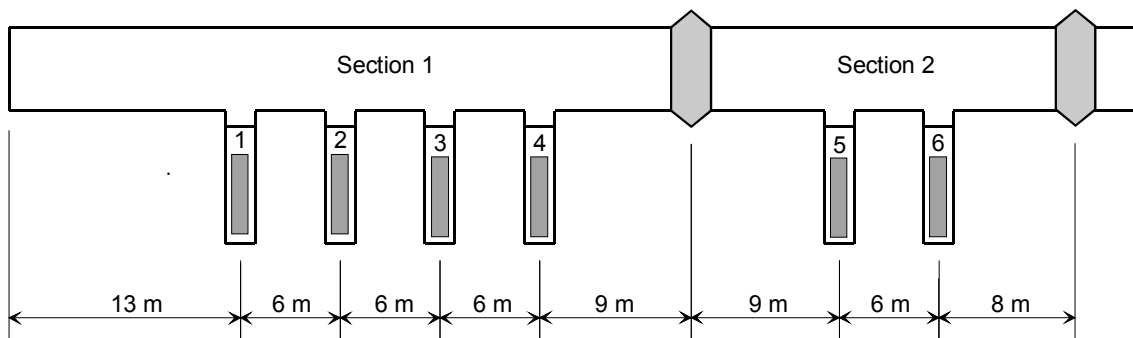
Schematic view of the layout of the Prototype Repository.
